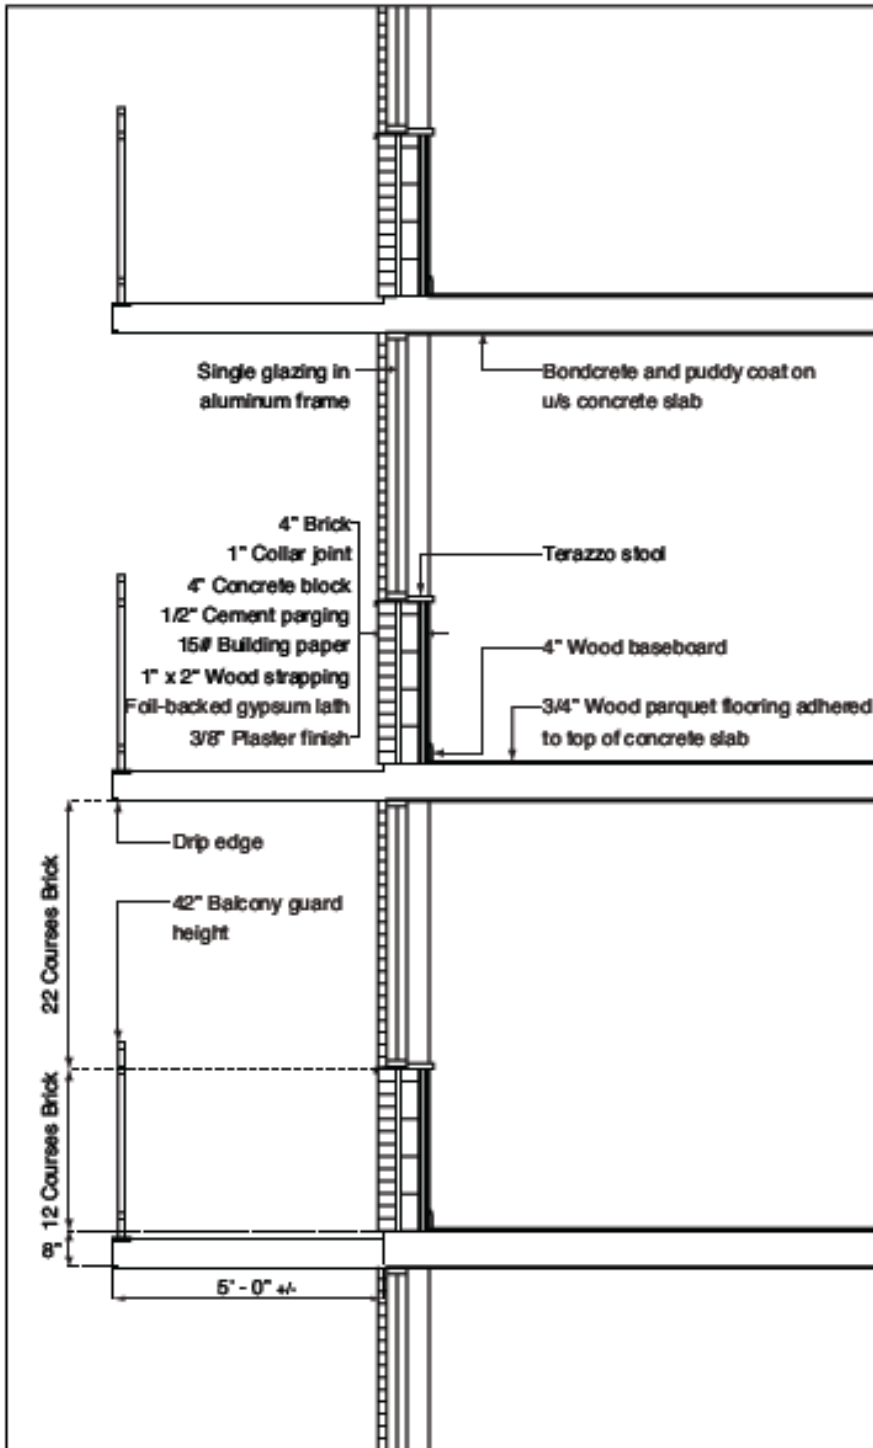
Balcony Section (Kesik & Saleff, 2009)
